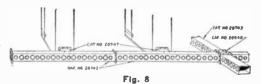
shows one method of using Square Duct trough to connect power panels in one common gutter. It also illustrates the use of the junction box as a cross fitting.
